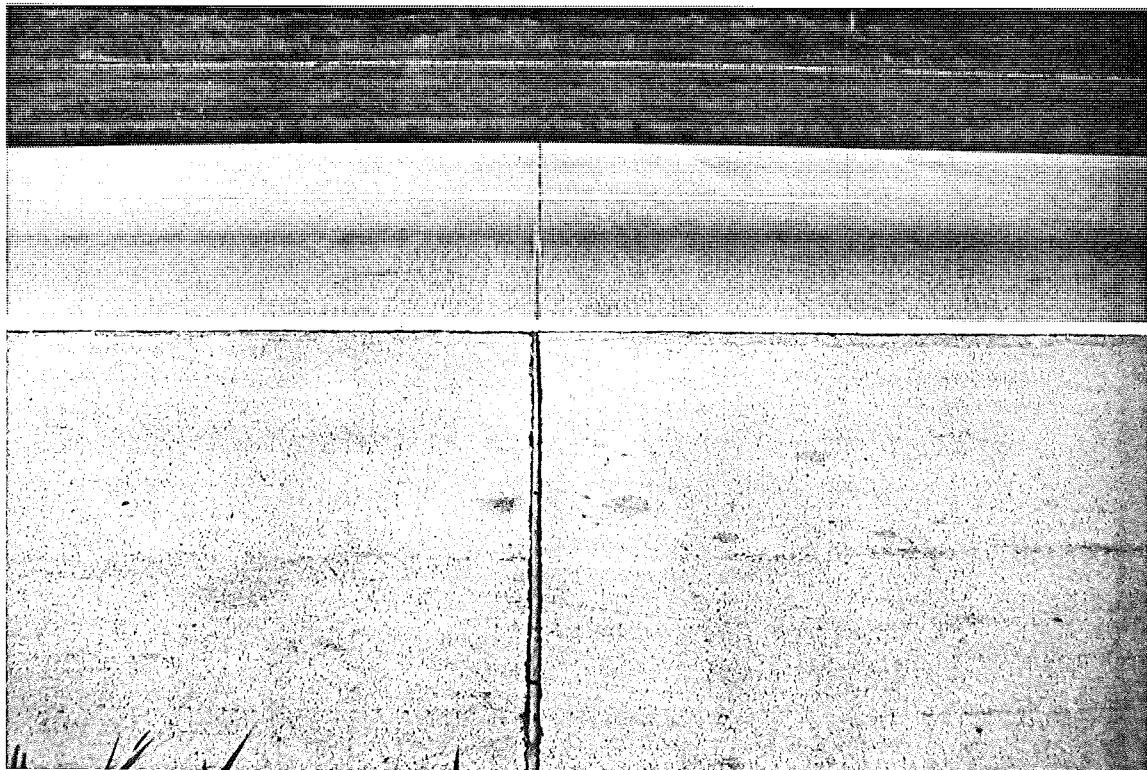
An expansion joint on CSN# 19042-24680A (Section B) EB showing some distress in the joint sealant. Sealant damage was present in several locations in the test section.
